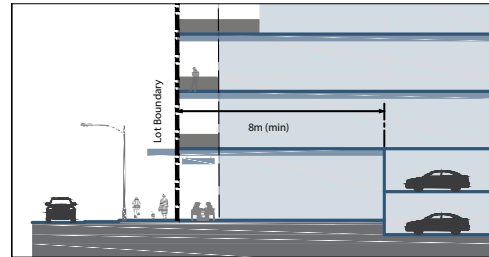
At grade parking, non-residential ground floor use- Attached Building Types
